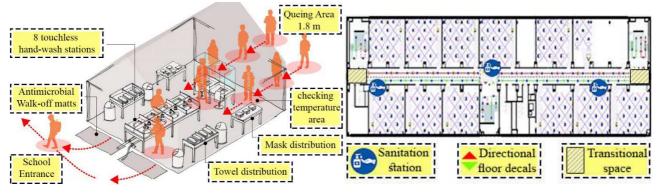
(left) : Prefabricated handwashing stations before each entrance of the school, upgraded from (Dubey, 2020). Fig. 11 (right) :Social distancing in classrooms and paths, upgraded from (Dubey, 2020).
